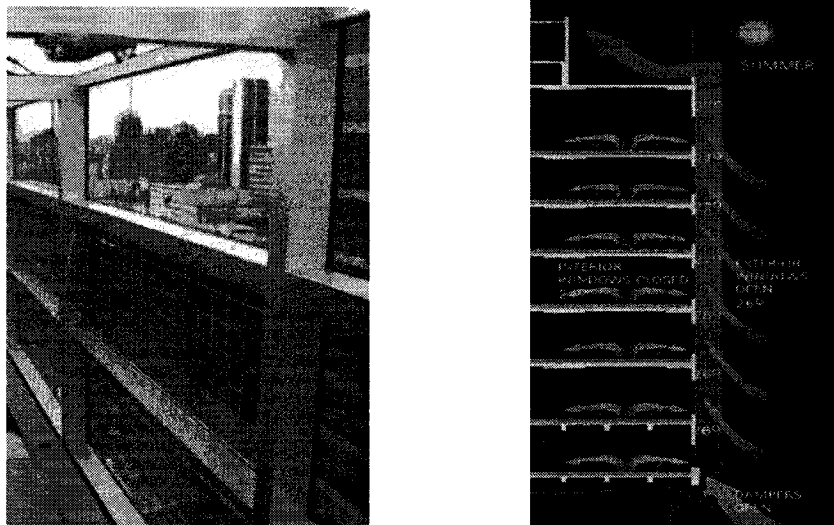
Exterior appearance and system layout of the William Farrel building (Natural Resources Canada, 2004)
